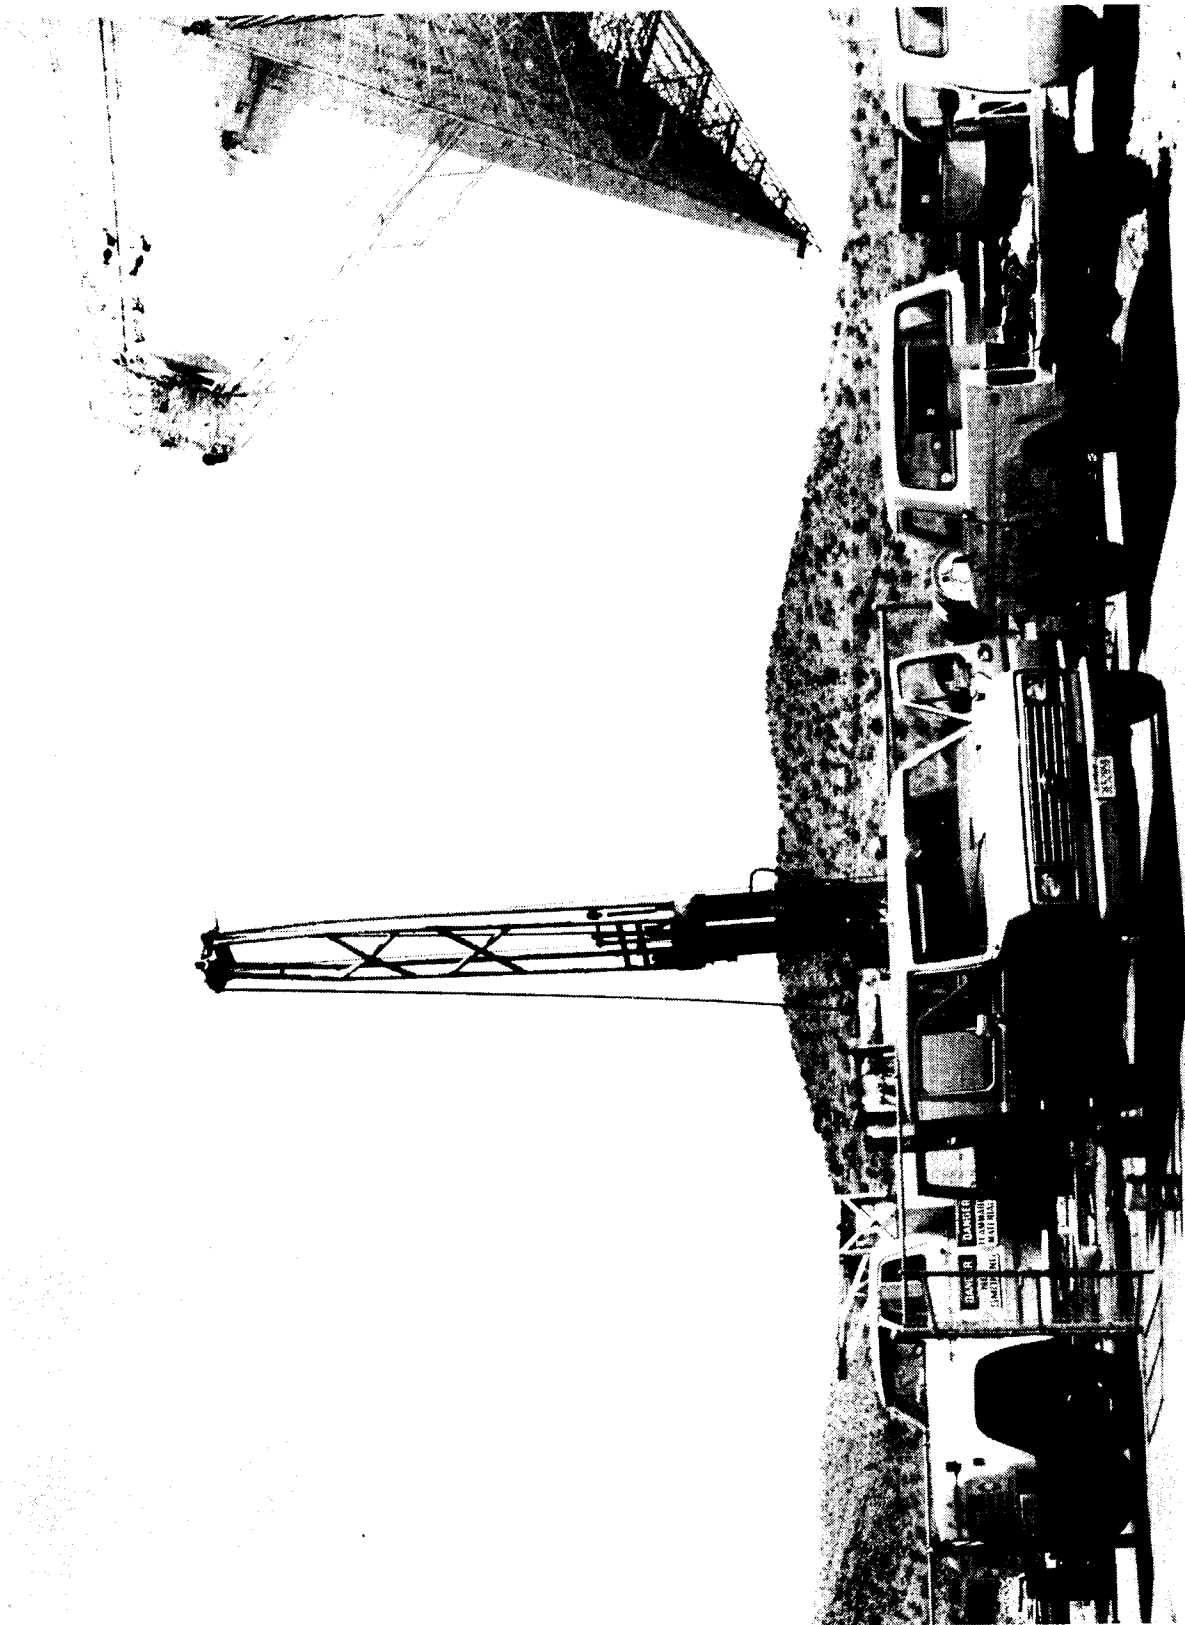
Mars Site: Close-up View of the CME-75 Drill Rig Used to Obtain Soil Samples
